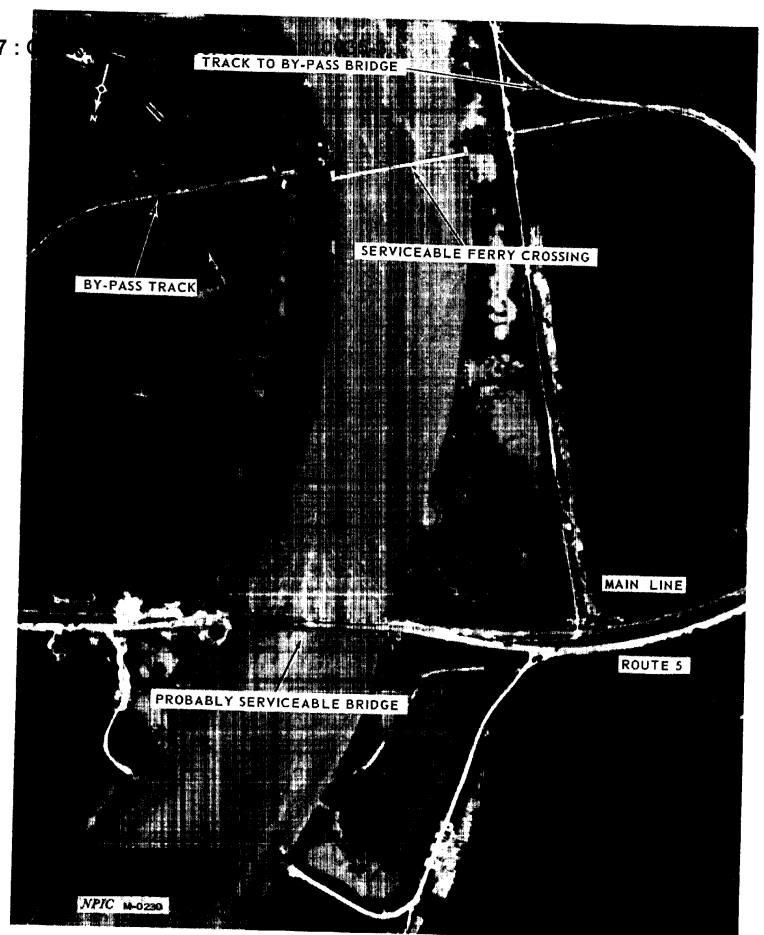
HAI DUONG RAILROAD YARD AND BY-PASS UNDER CONSTRUCTION, NORTH VIETNAM
